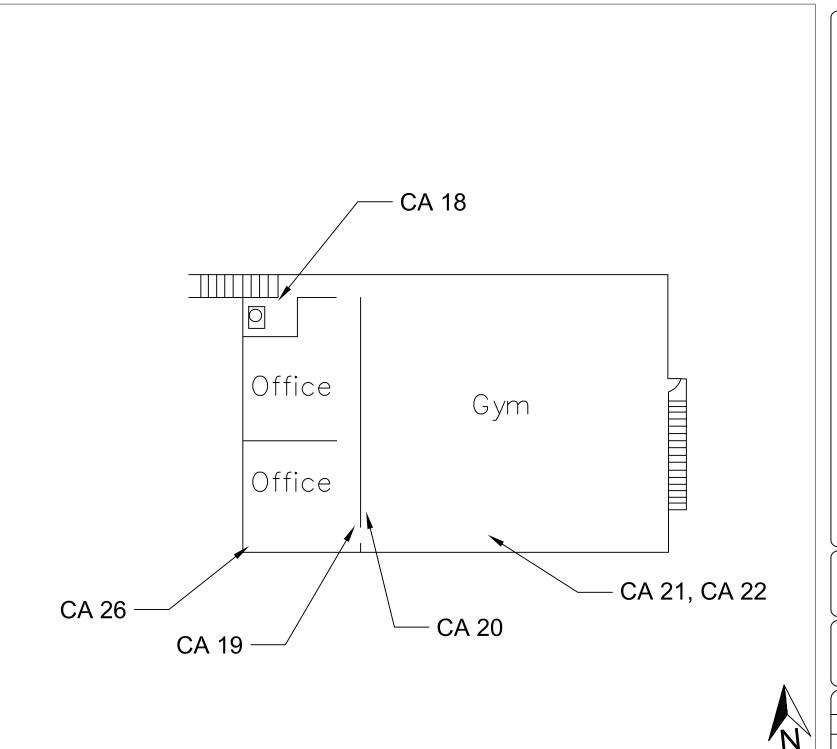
Sample Locations YWCA Recreation Building Floor 2019 14th Street Santa Monica, CA 90405
